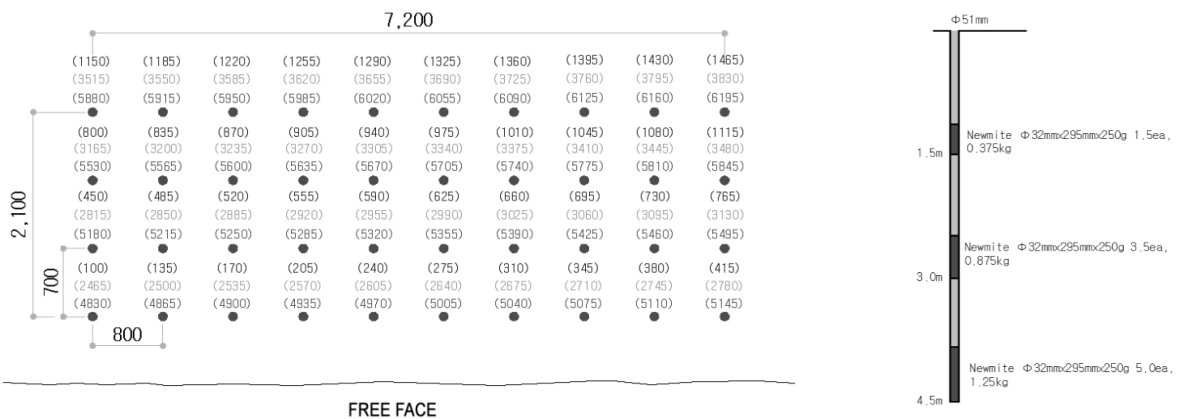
Blasting pattern of horizontal deck-charge blasting method (40 holes)
